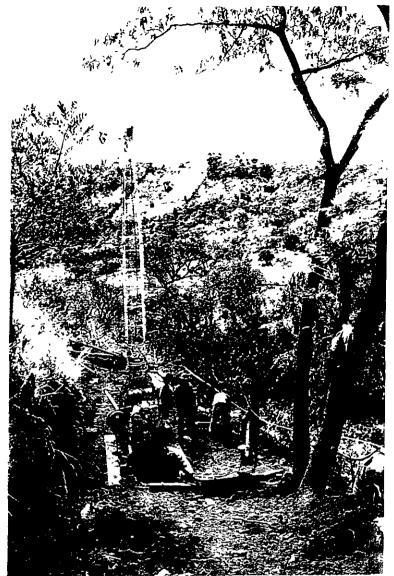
ROAD ACCESS ACROSS THE TOROLA RIVER
